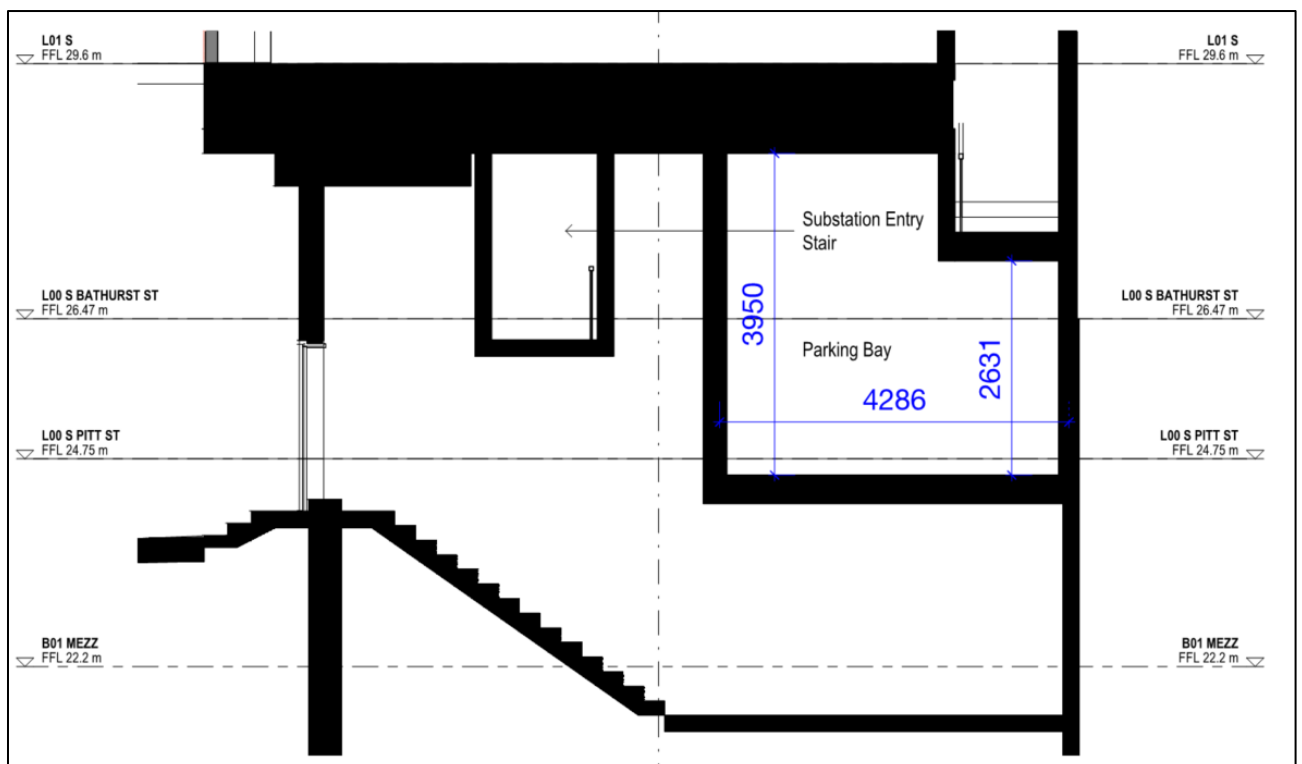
Cross section A elevation view between level B01 Mezz and level L01
